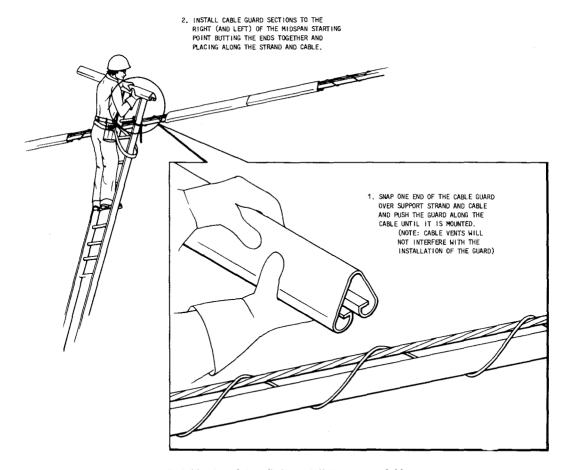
E Cable Guard Installed on Self-Supporting Cable
